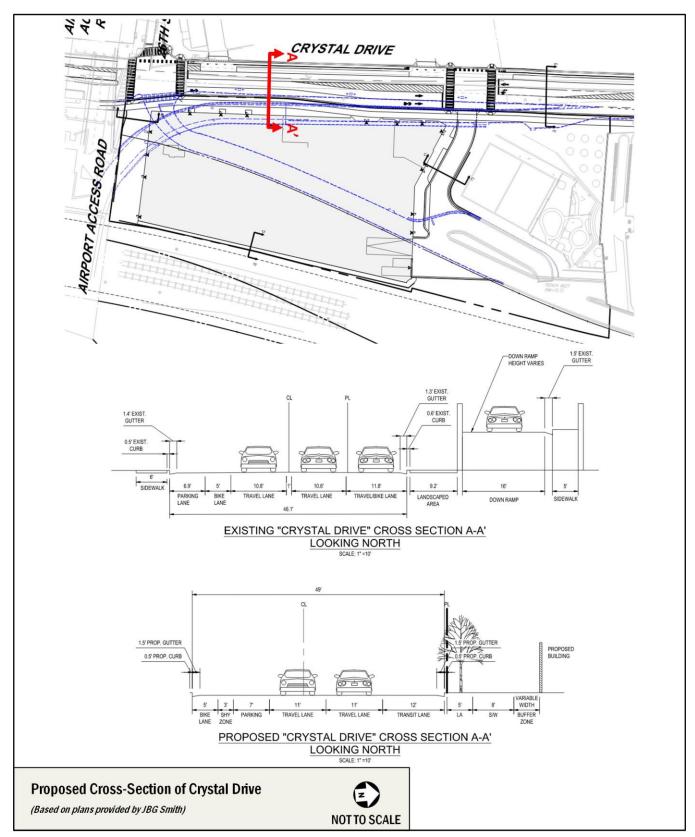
Typical Cross-Section of Crystal Drive between 26th Street S and Crystal City Service Road
